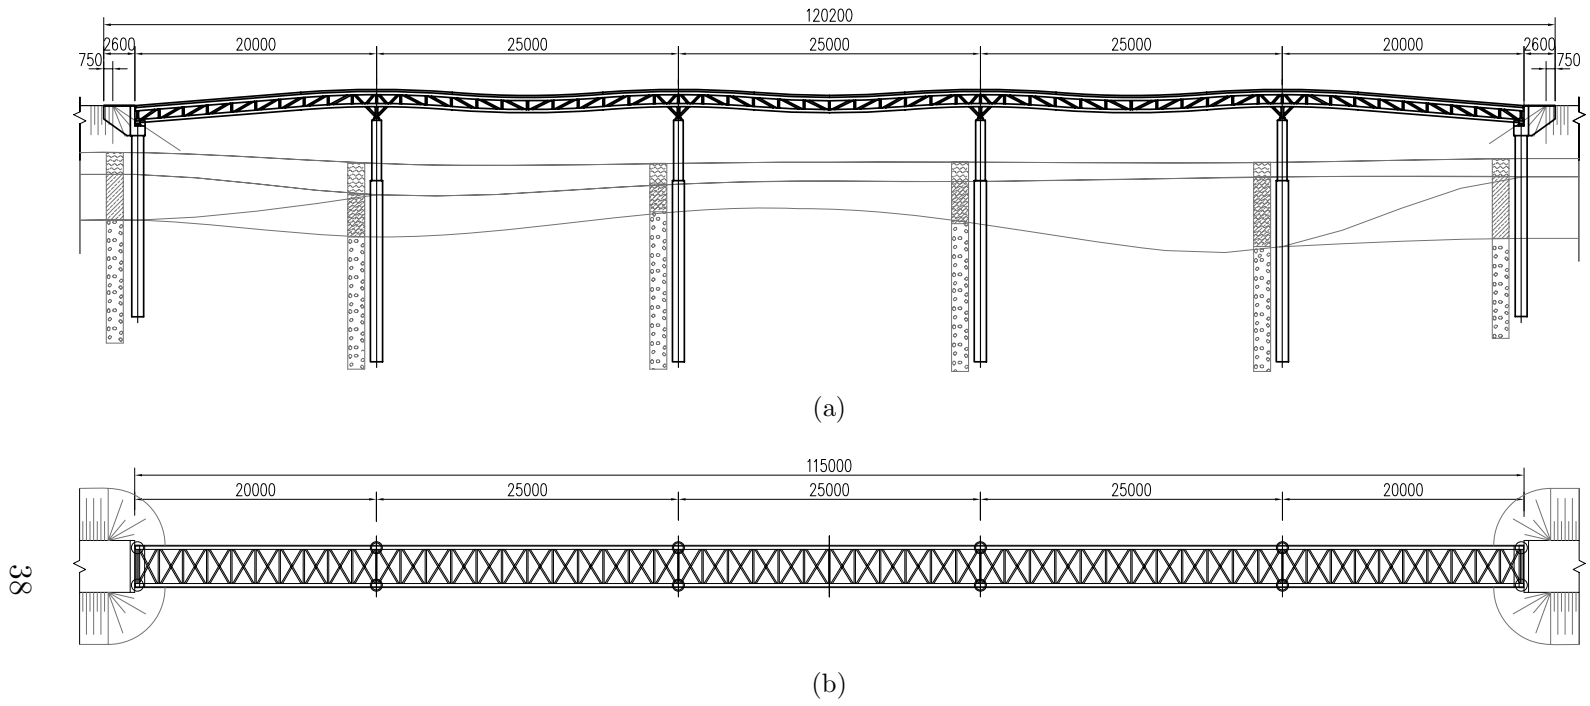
Configuration of the Fenghe Bridge: (a) Elevation and (b) Plan (unit: mm).
